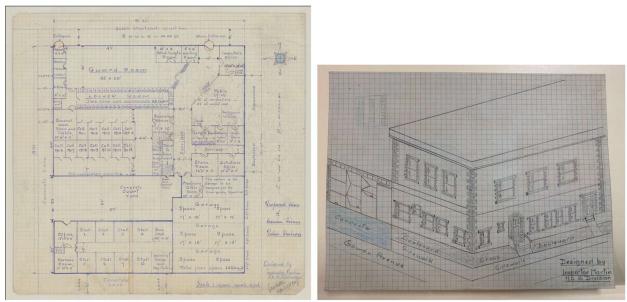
The City of Toronto Archives holds a floor plan and perspective drawing of the proposed station designed by Inspector Martin of the No.6 detachment. Many similarities exist between this proposed plan and the final plans prepared by the Office of the City Architect, but archival newspaper articles reveal there were significant issues with scale and constructability in the non-professionally prepared version (City of Toronto Archives; Fonds 200, Series 2347, Items 825, 826).
